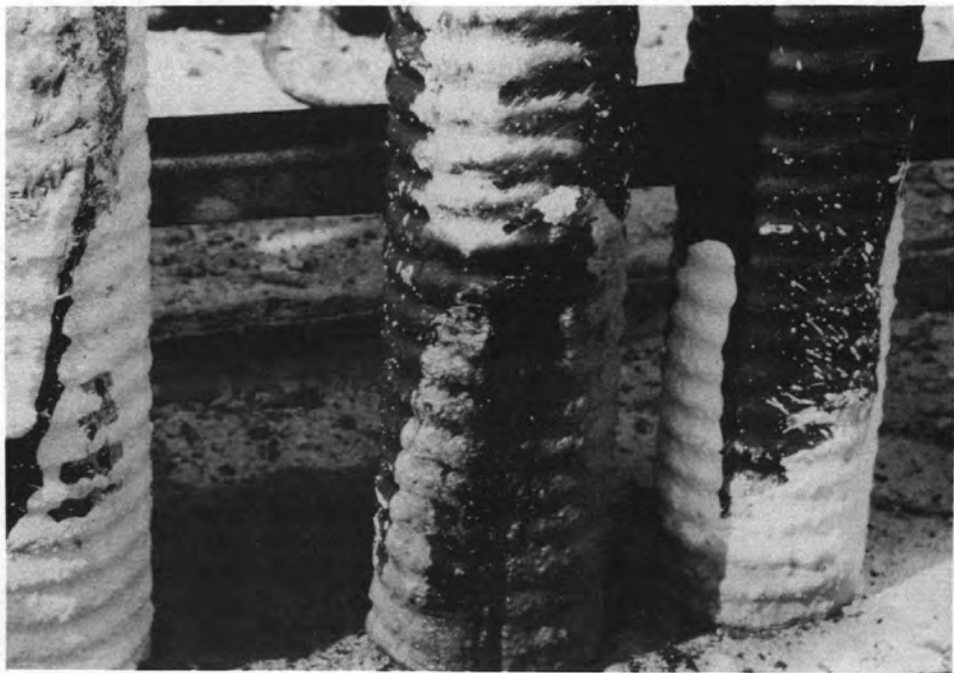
UNEXPOSED SIDE AFTER TEST
